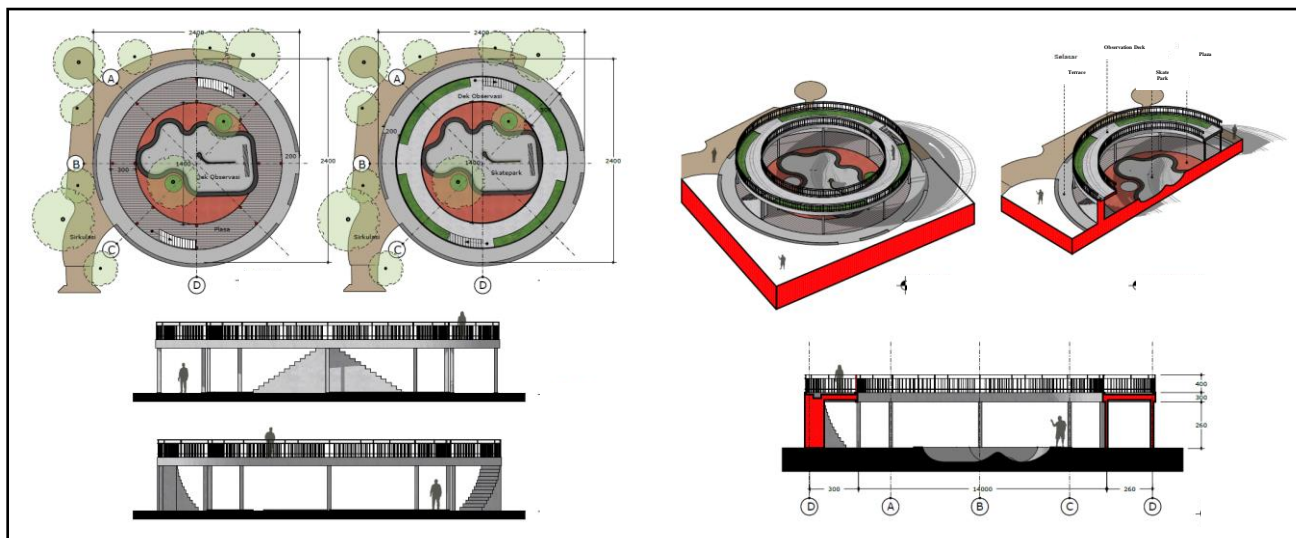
(a) Observation deck floor plan and views (b) Sections and axonometry
